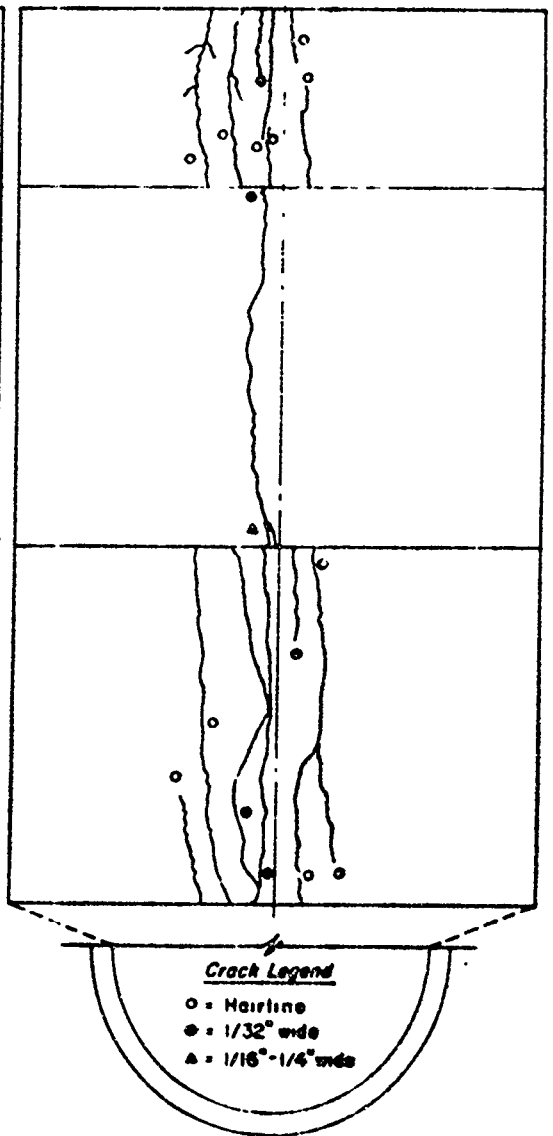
Crack survey of bottom half, developed; concrete Conduit 3.2e.
